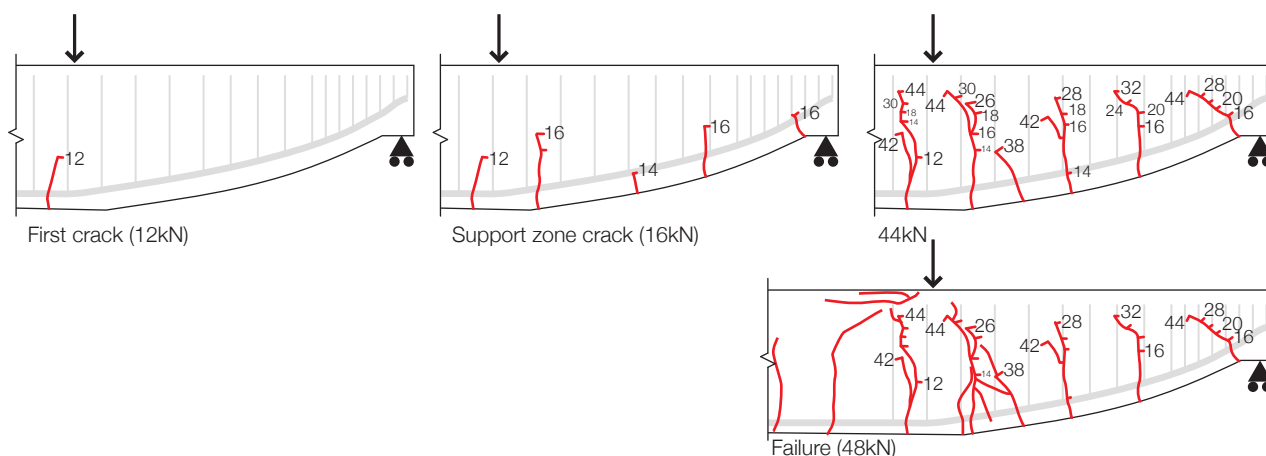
Cracking and failure in Beam 9\_2\_CFP\_M(ii).
